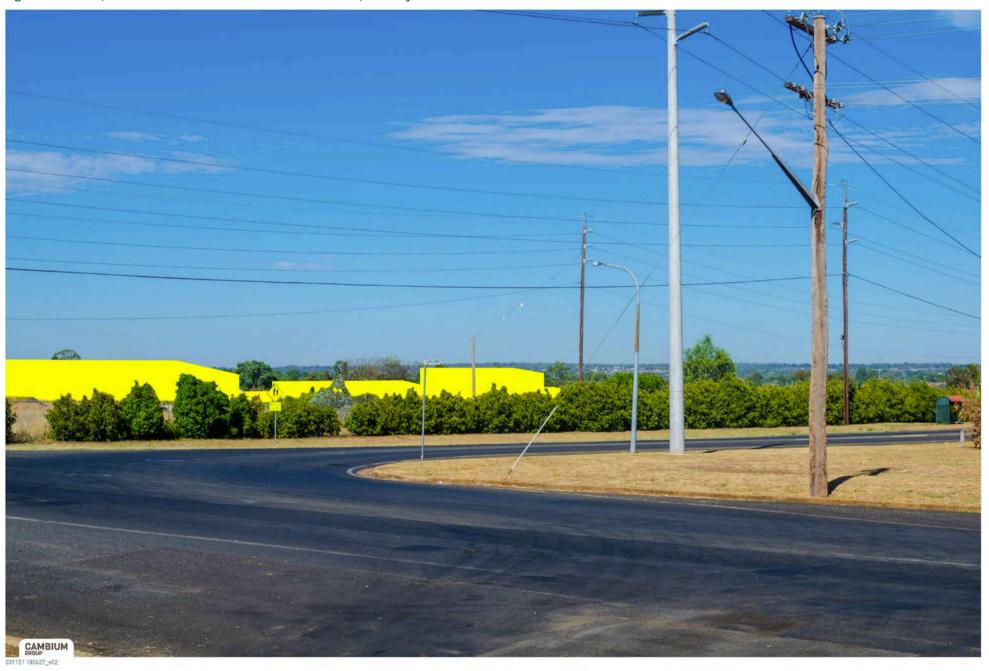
VP1 (White Street/Welchman Street intersection) - Proposed view
